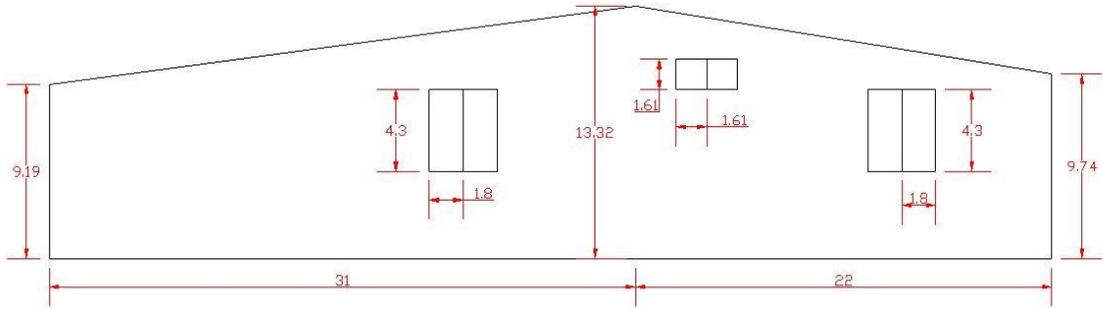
Side 1 of the building, facing North West drawing details dimensions in feet
